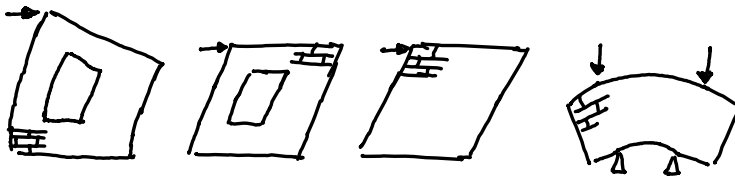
Schematic deformation of the walls and the spandrels. From left to right: a wall with an opening with a cantilever boundary and with a fixed or double-clamped boundary; a wall without openings under a fixed boundary; a spandrel under four-point bending.
